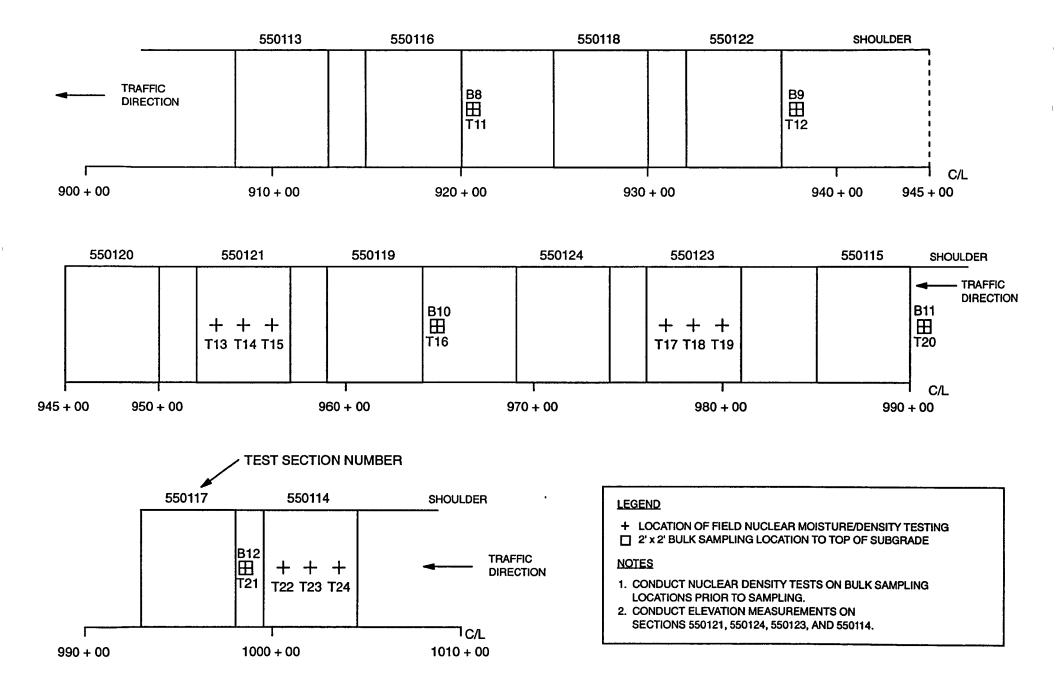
Overview of Sampling and Testing Plan for Existing Subbase.
